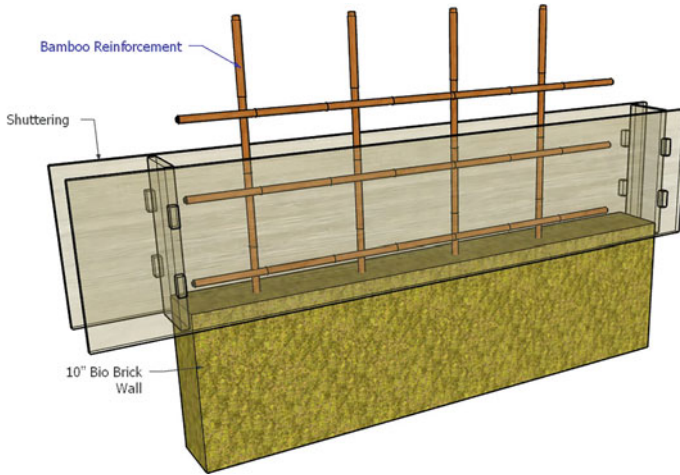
Shuttering and bamboo reinforced for on-site wall construction
